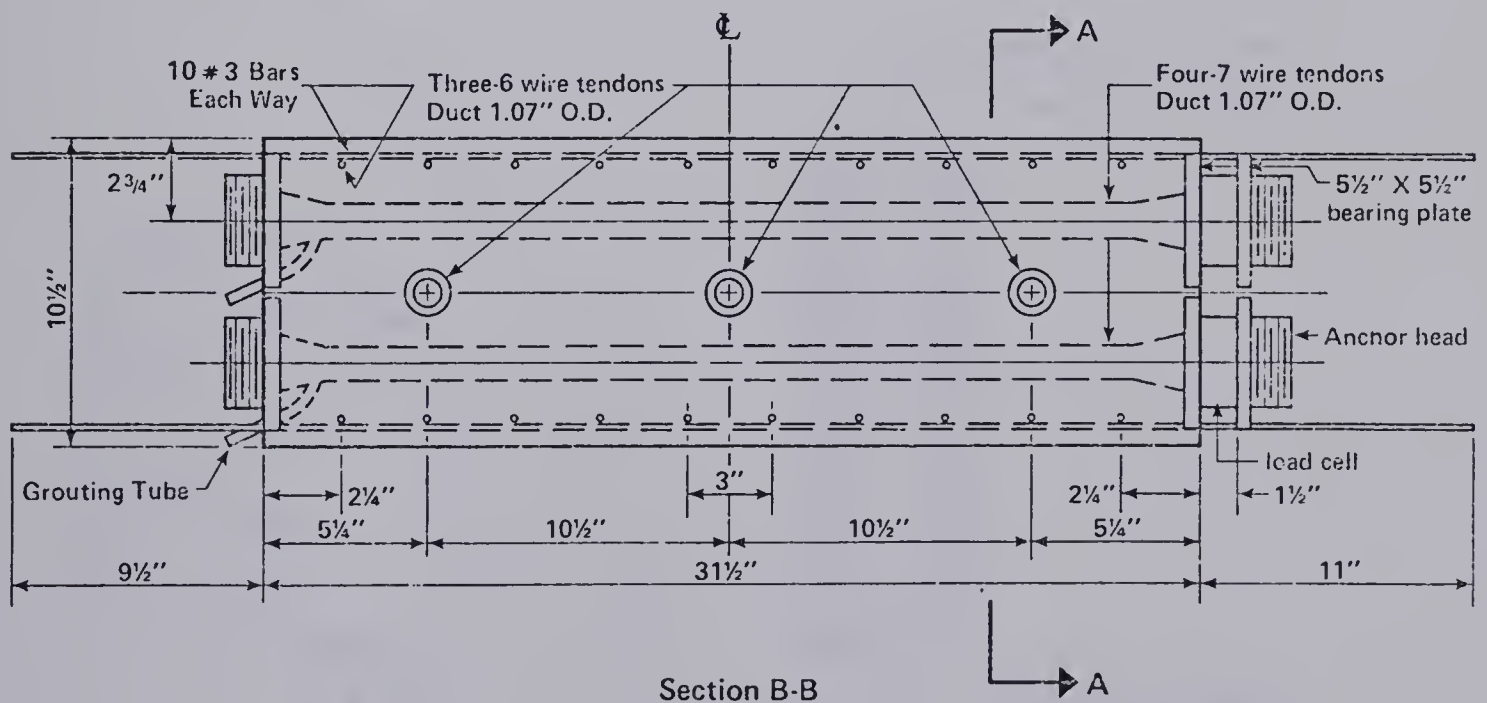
Typical Section B-B Through Wall Segment Specimen
